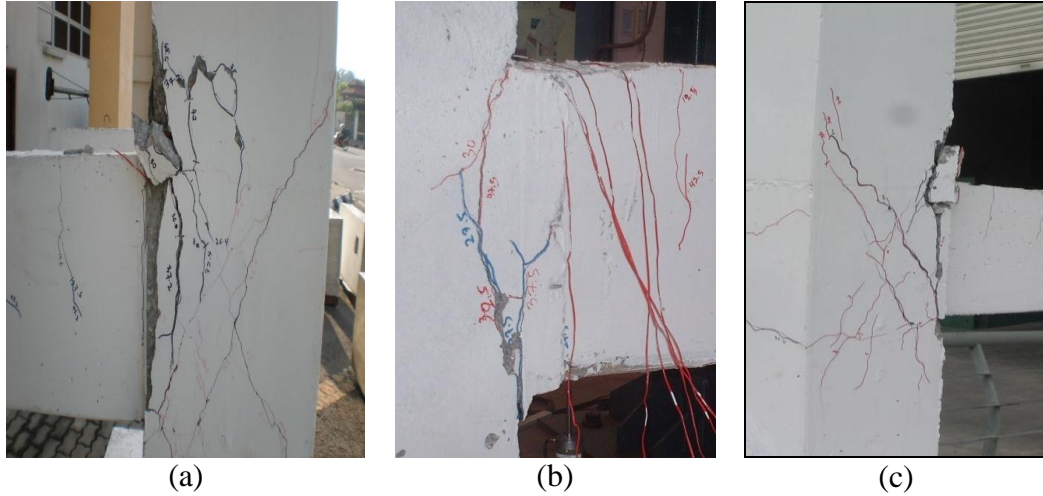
Visual damages occurred in Specimen 2 with additional of three reinforcement bars starting from 1% to 3% drift under vertical cyclic loading; (a) some diagonal minor cracks occurred in column and beam-column interfaces; (b) surface cracks occurred on reinforced concrete beam; and (c) spalling of concrete cover on front surface of column.
